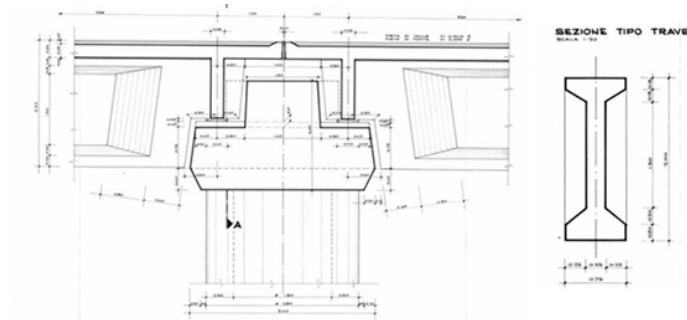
sx) Detail at pier; dx) Detail of beam dimensions – typical section
